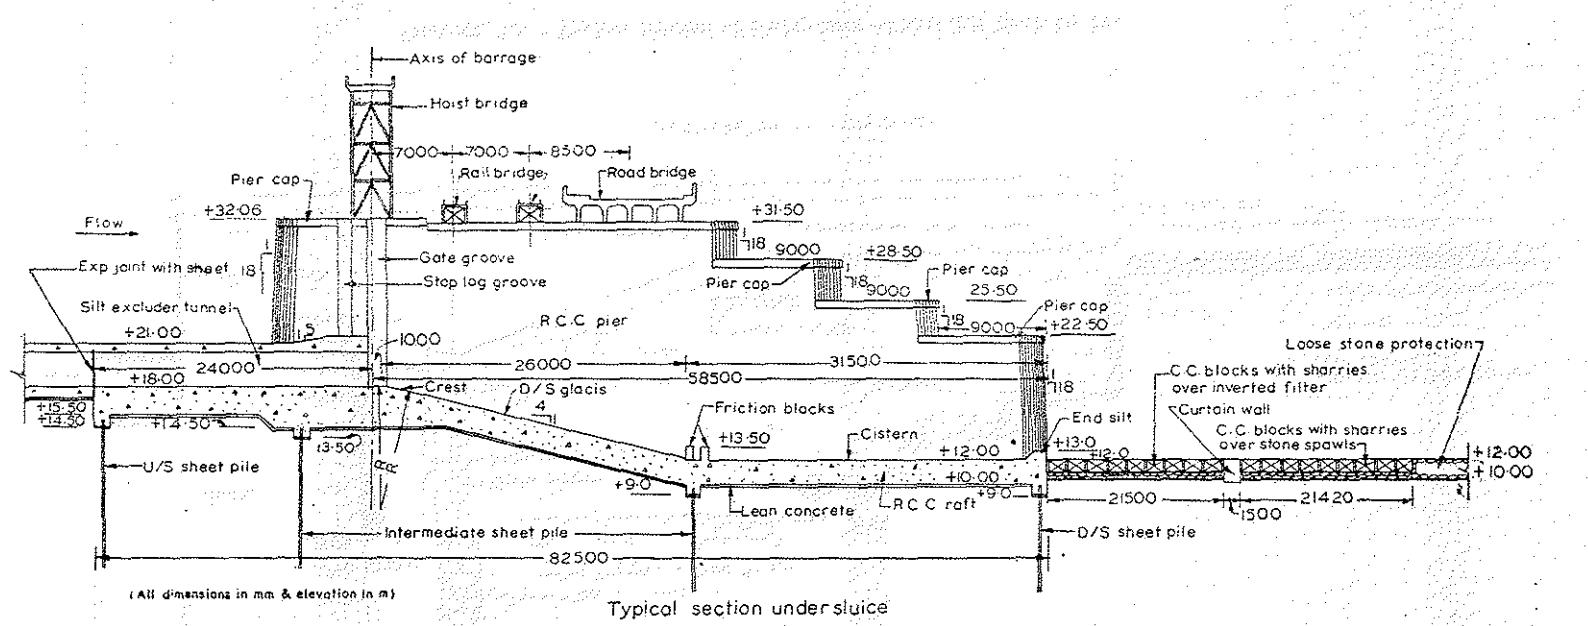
Typical Section of Undersluice with Silt Excluder bay.
